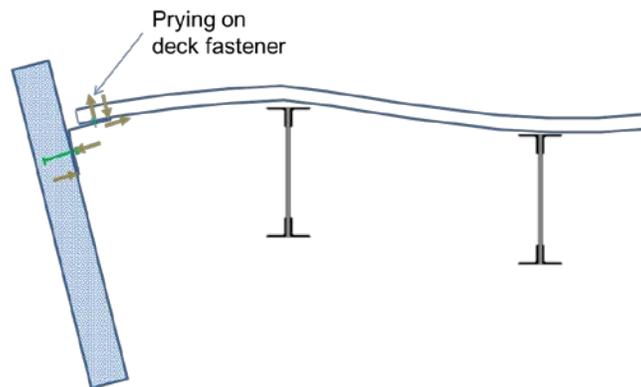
Deformations and change in angle between roof diaphragm and wall and prying on the connection to ledger
